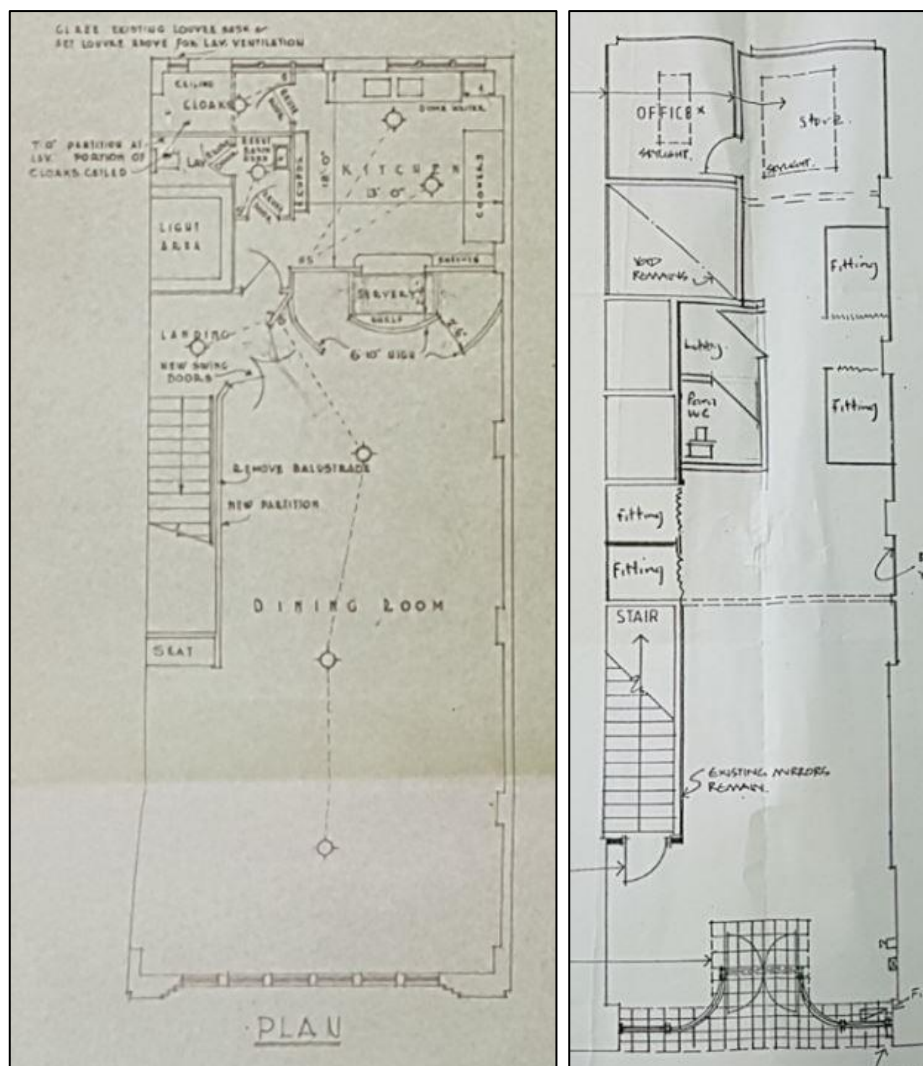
Left: Detail of 1939 ground floor plans for conversion of 18 Kelvin Street into dining rooms (Gray Bros Ltd, 1939). Right: Detail from 1993 ground floor plans for refurbishment of 18 Kelvin Street (Baxter Hesselin McDowell Architects, 1993).
